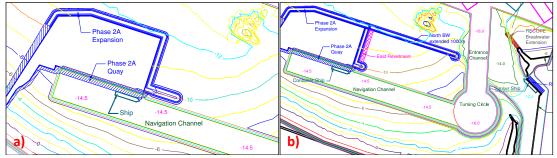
Assessment of stub breakwater length and north breakwater extension.
